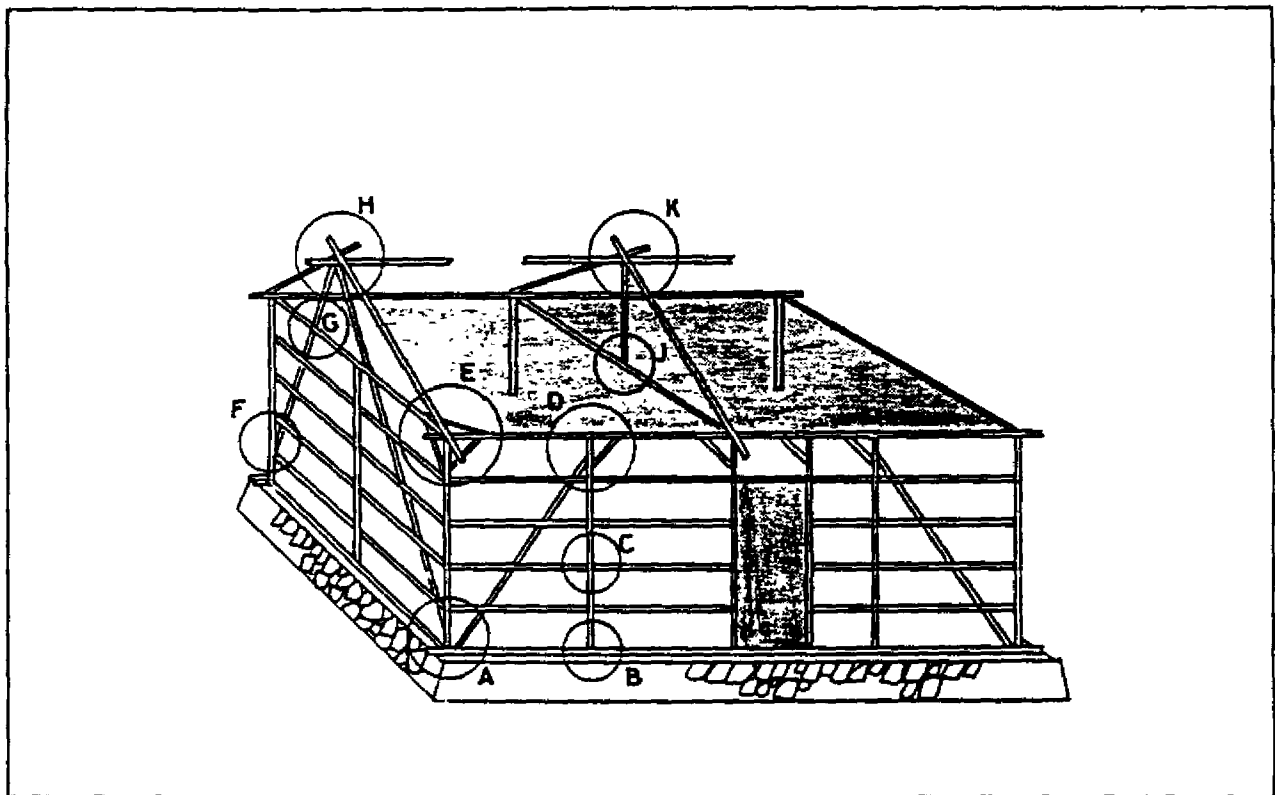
Bamboo Frame Structure with Wall Covering of Woven Bamboo [4]
